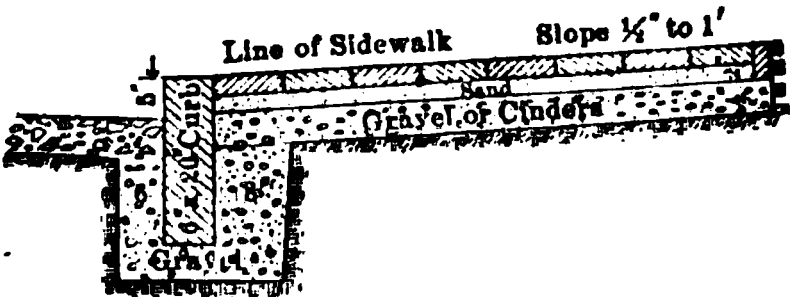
Brick Sidewalk and 6 by 20-in Curb on Gravel Base
